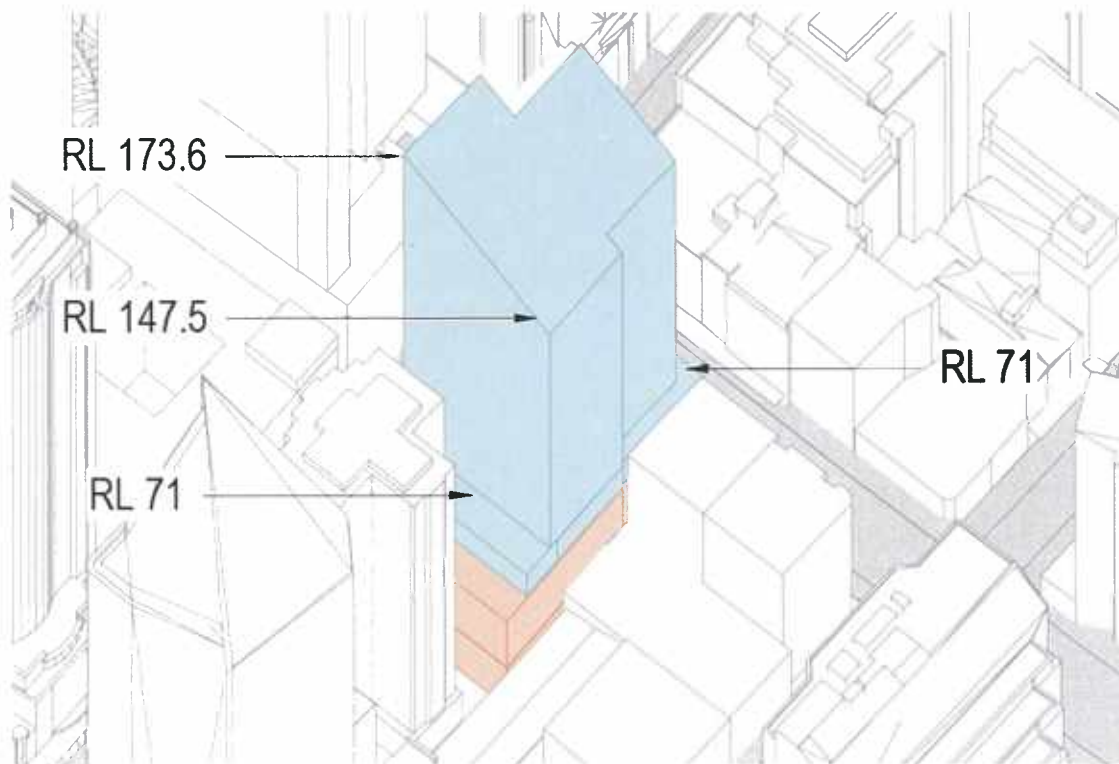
Proposed Pitt Street South OSD building envelope (axonometric diagram from southeast).
